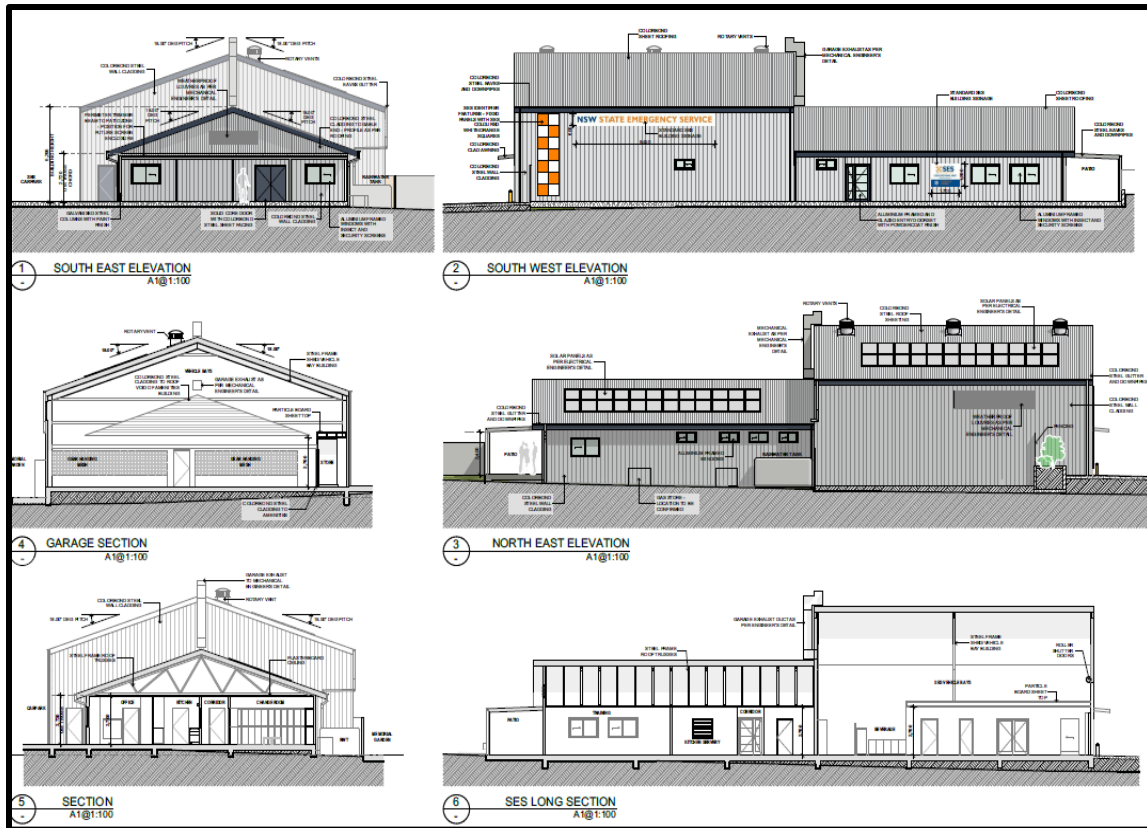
Elevations and Sections (Source: Figgis + Jefferson Tepa)
